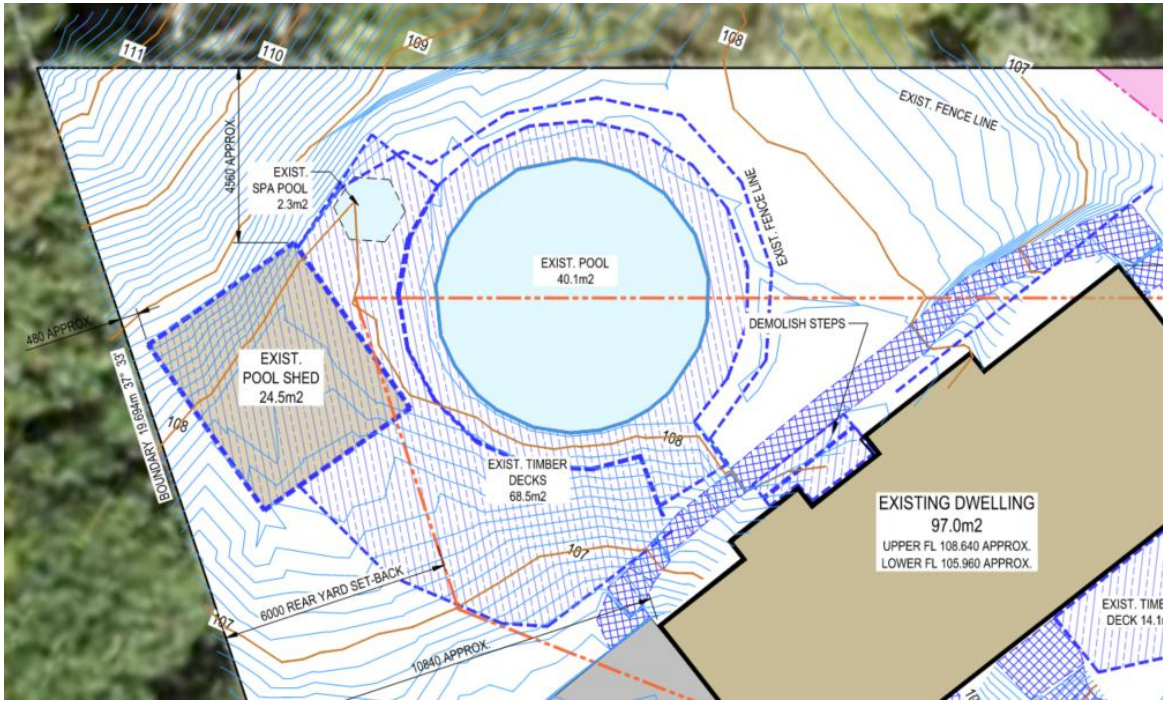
Screenshot from Architectural Drawings showing Layout prior to Construction/Proposed
